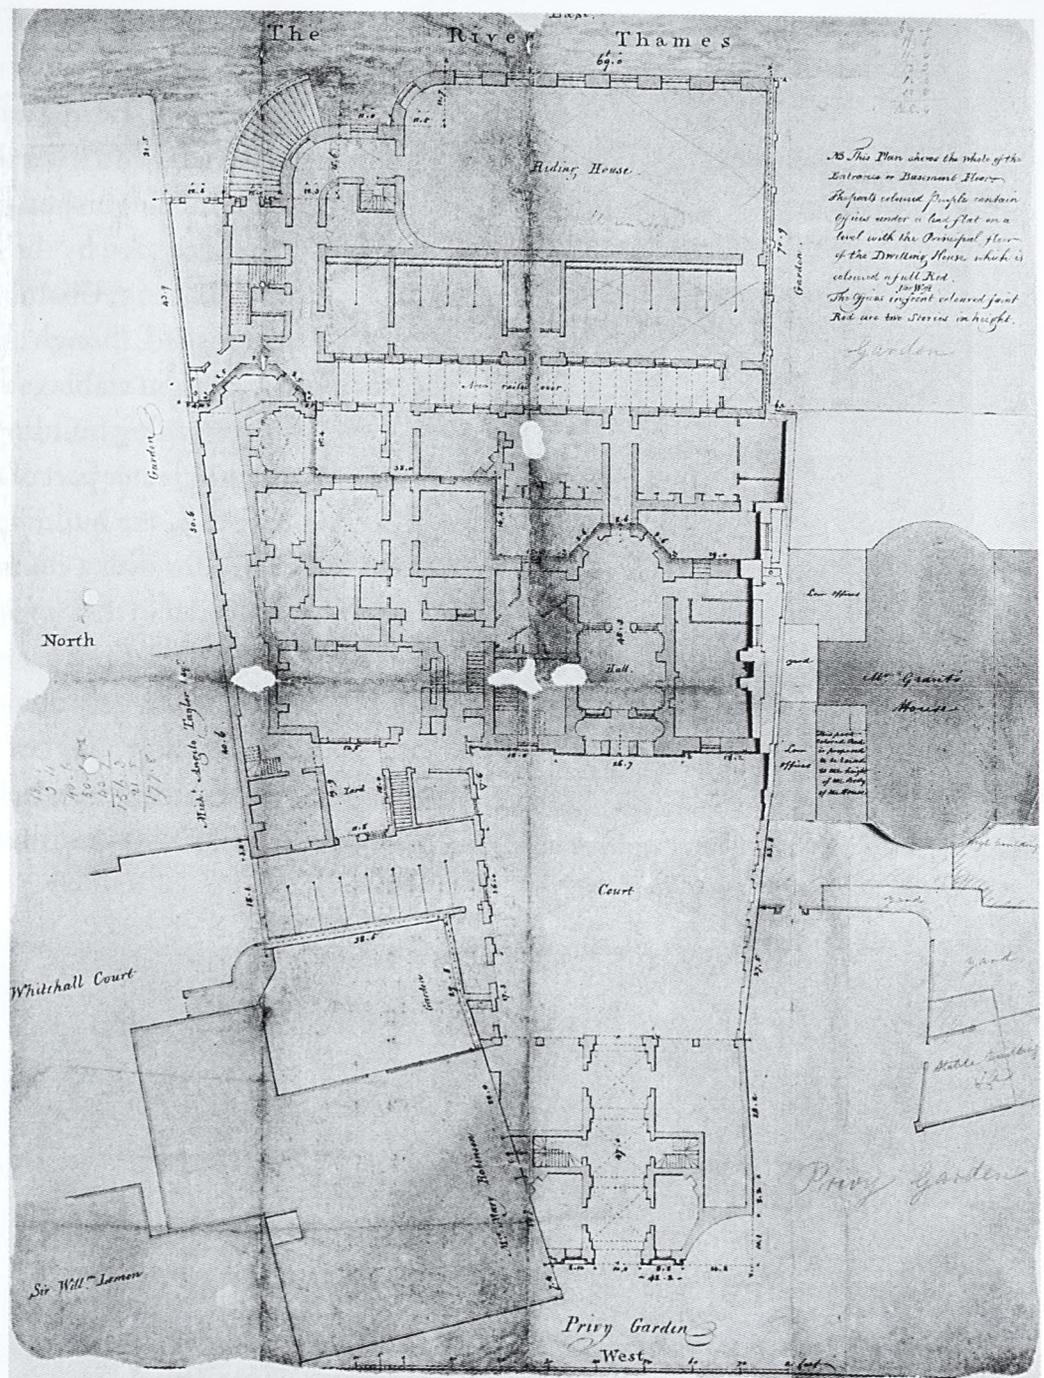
Ground floor plan of Pembroke House 1803, Public Record Office.
